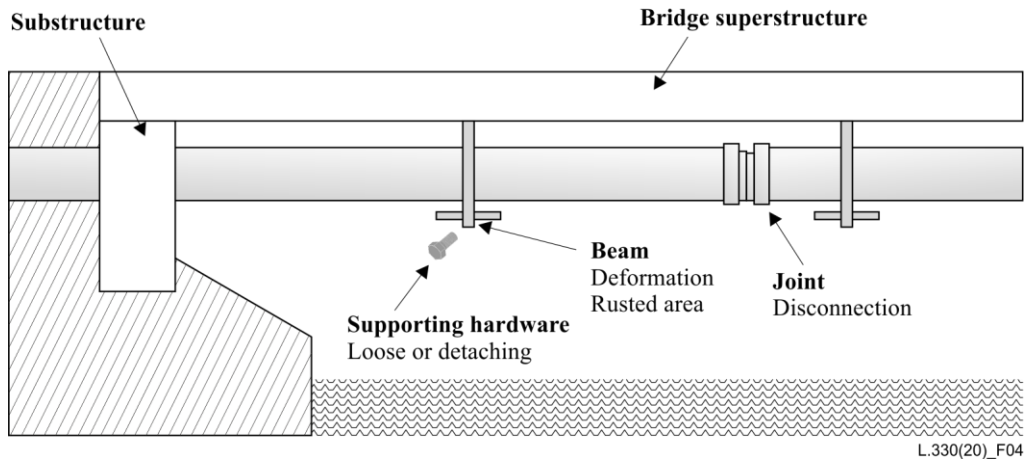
Bridge-supported conduit and its inspection items
